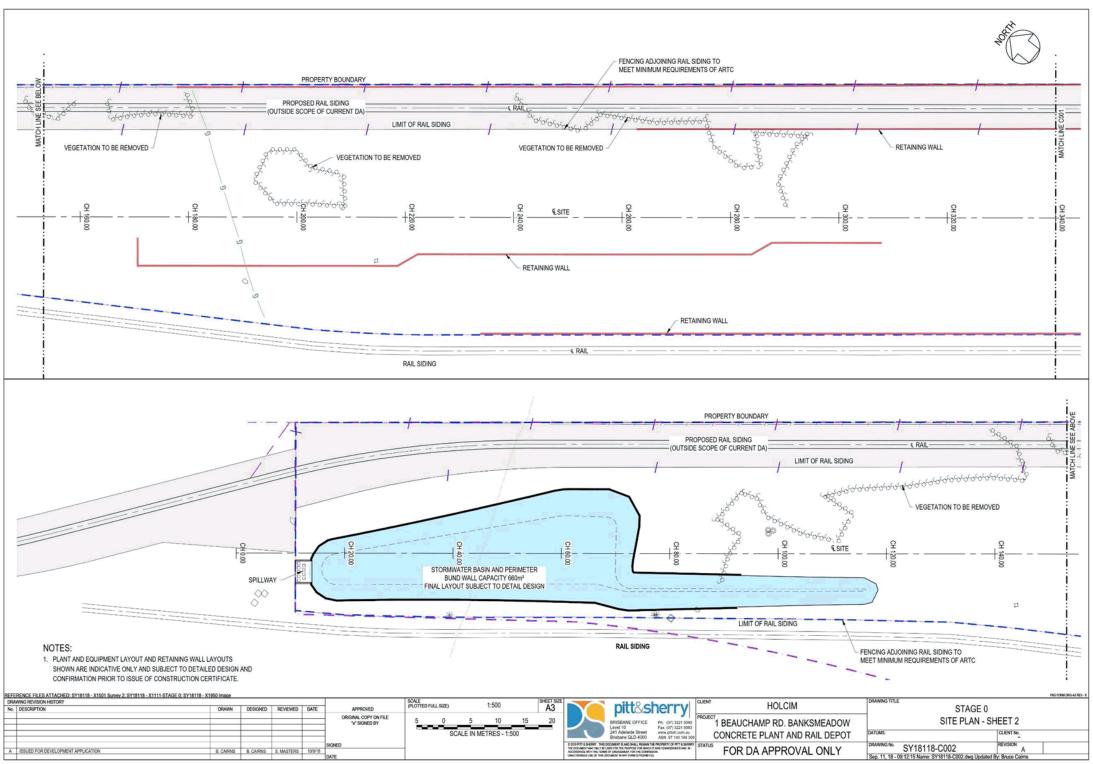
Stage 0 Concept Layout - Sheet 2 (Subject to Detailed Design)
